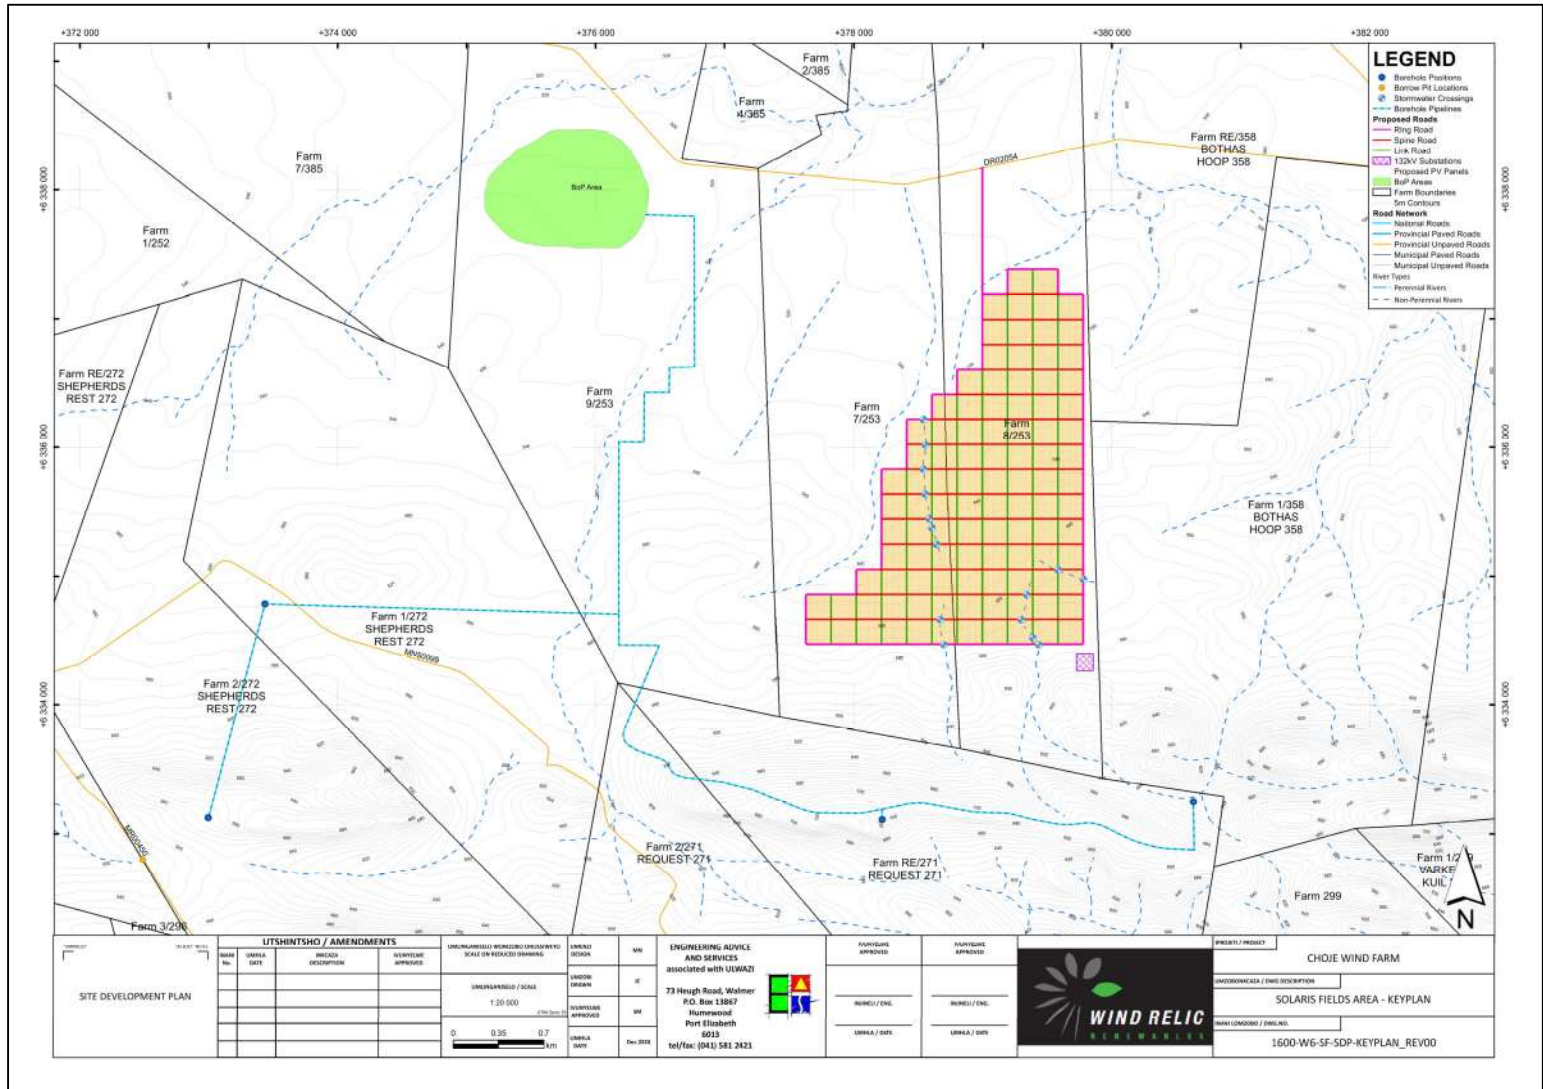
Solaris Fields PV Facility Site Development Plan (Provided by WindRelic).
